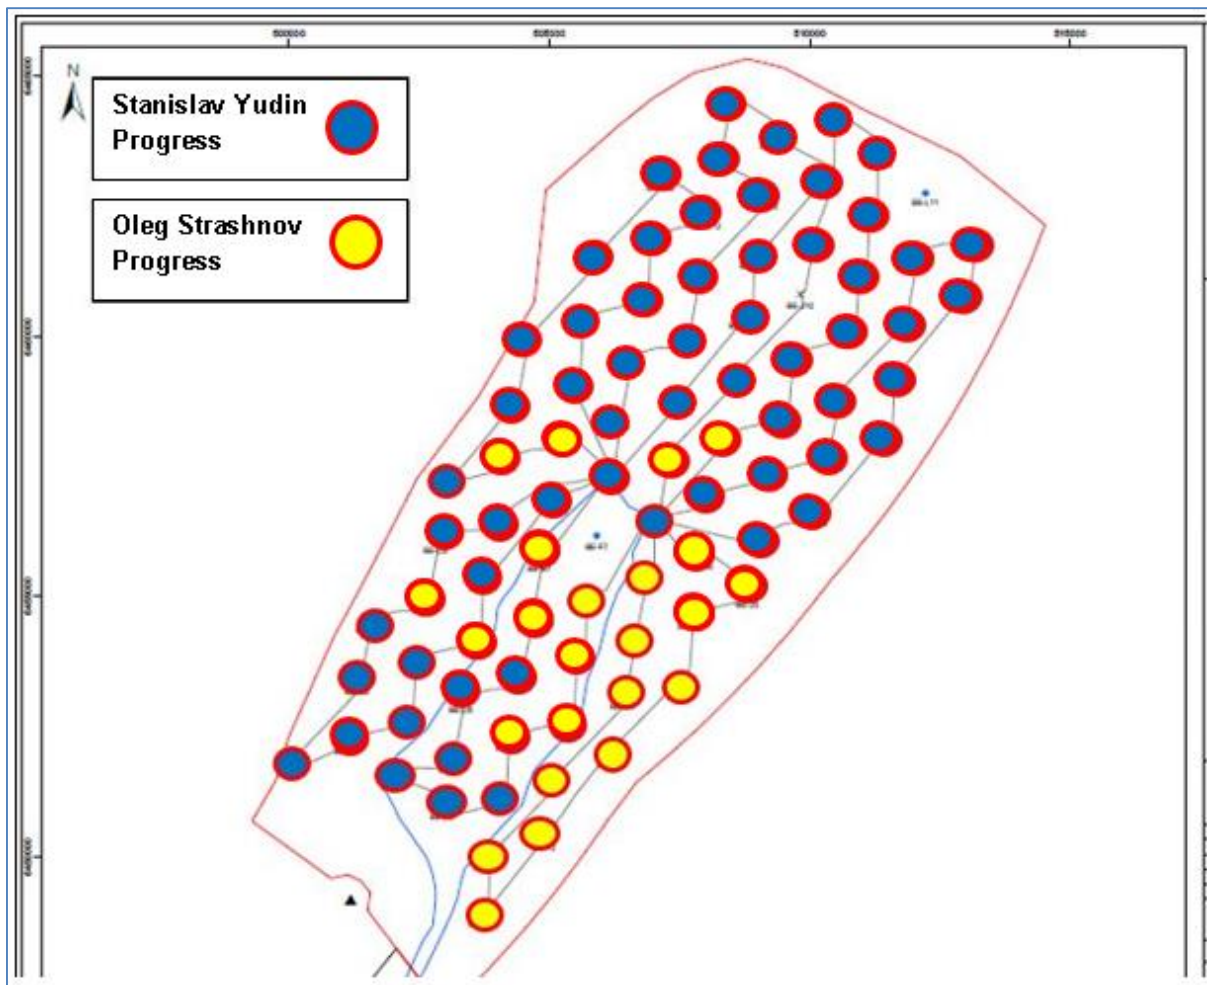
Pile installation completed at 85 Locations & Foundation installation completed at 24 Locations
